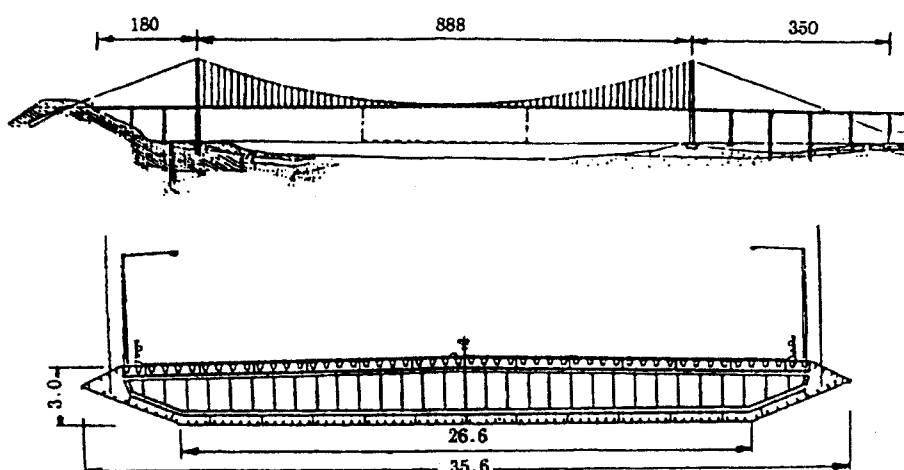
General view of Tiger Gate Bridge(Unit: m)
